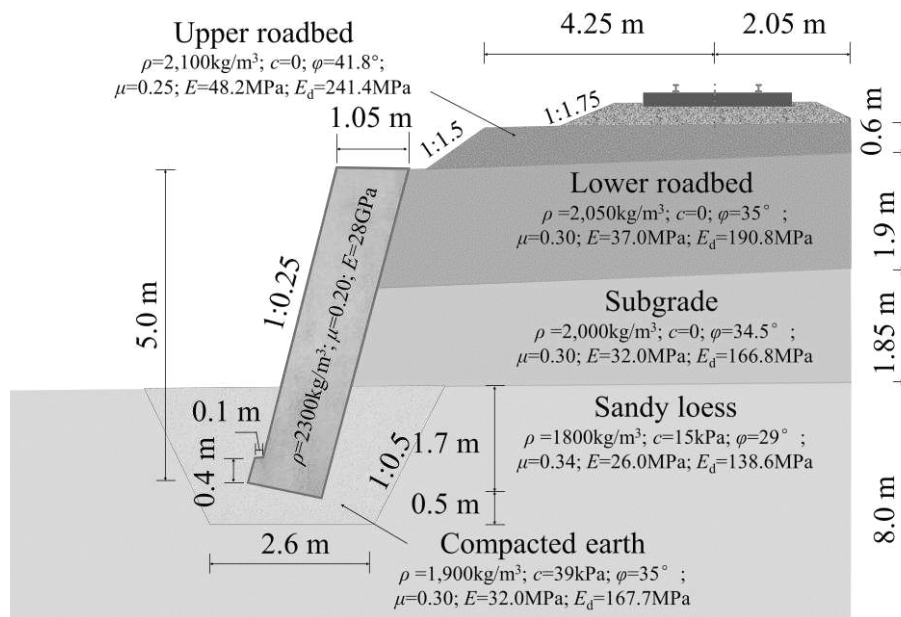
Cross-section of in-situ test and parameters of numerical model
